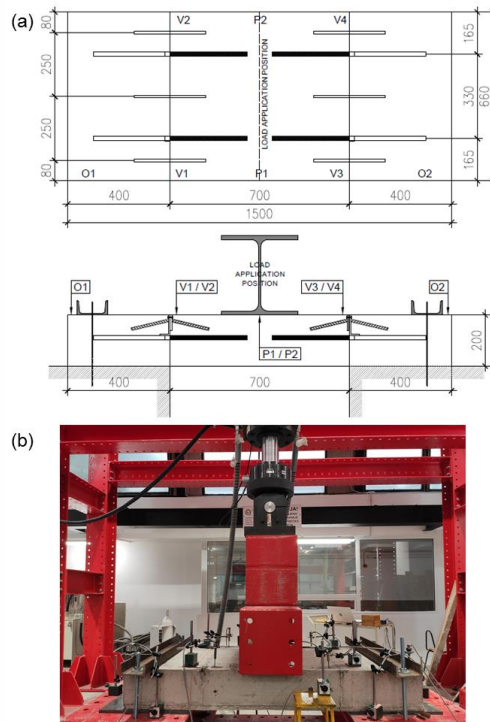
Test set-up: (a) measuring positions, (b) specimen during testing
